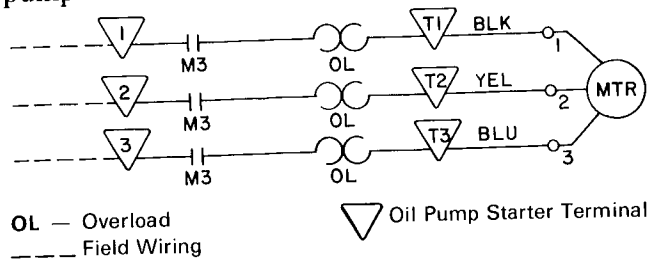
Oil Pump Wiring Schematic (Typical)
